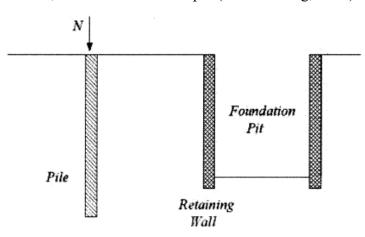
Layout of the axially loaded pile and retaining wall (Yu and Liang, 2010)
